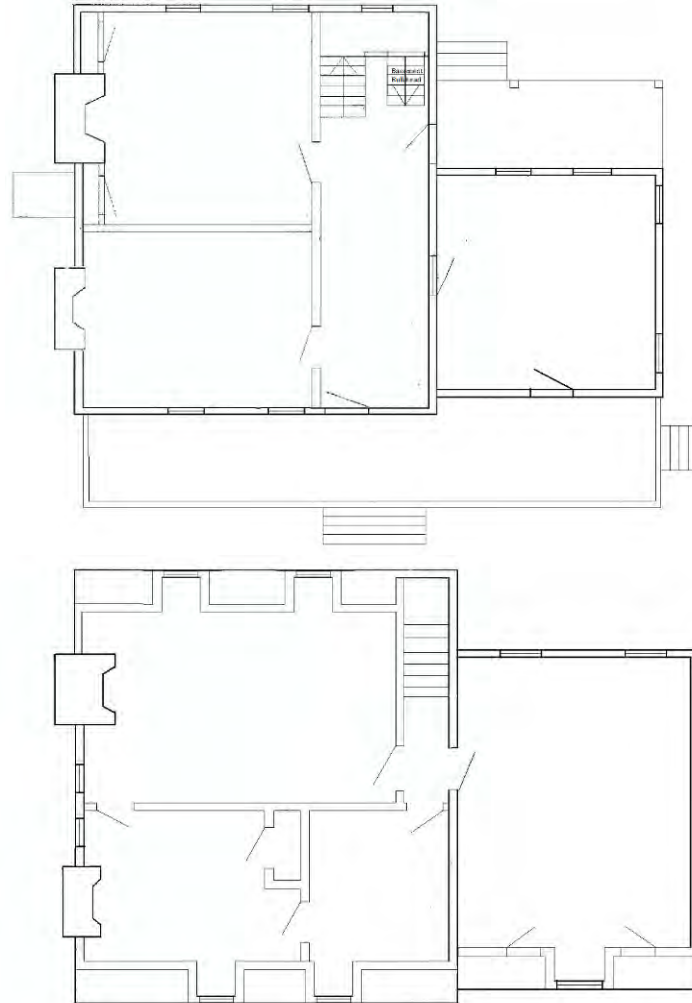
Reconfigured layout during Duval ownership, first floor (Top) and second floor (Bottom).
